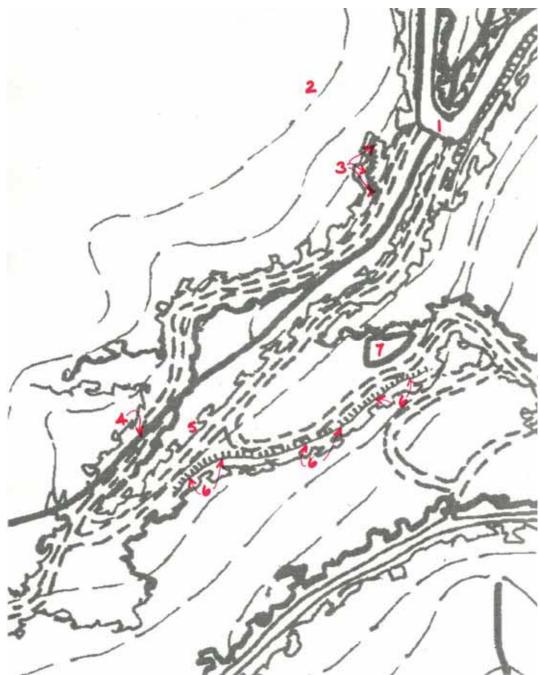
Detailed site plan showing site features along and near the 1832 bridle trail
